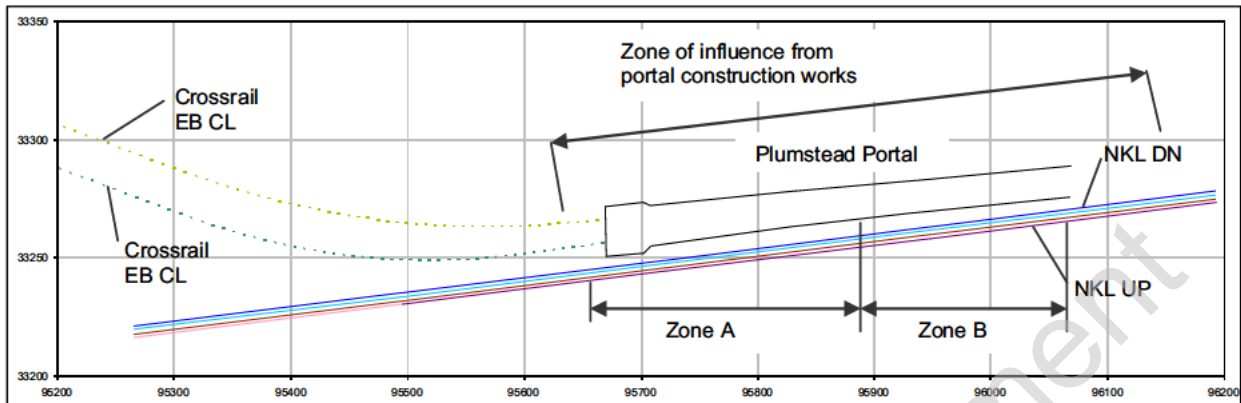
General arrangement of the NKL Up and Down lines, Crossrail works and zone of influence of the portal construction works. Zone A and Zone B indicate the extent of diaphragm wall construction and secant pile wall construction respectively.
